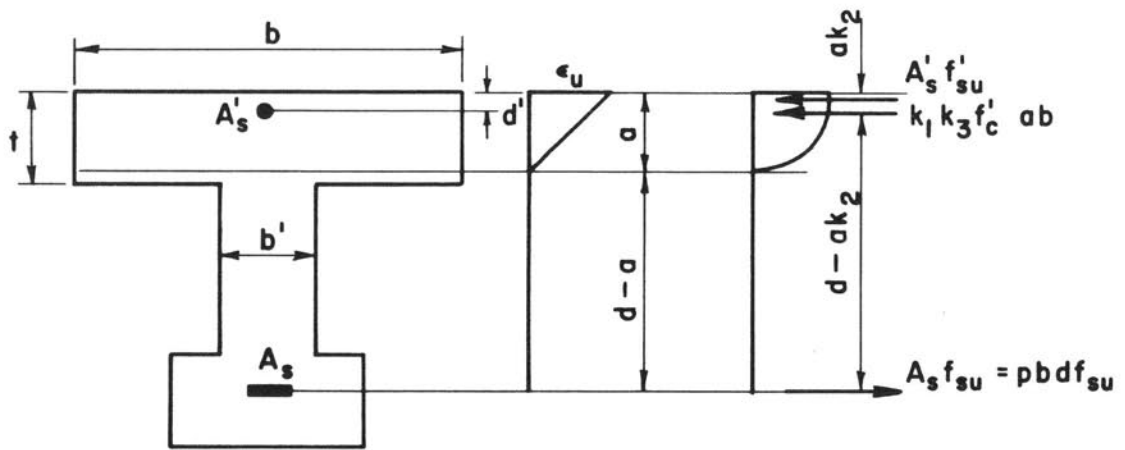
FLANGED SECTION, NEUTRAL AXIS IN THE FLANGE
